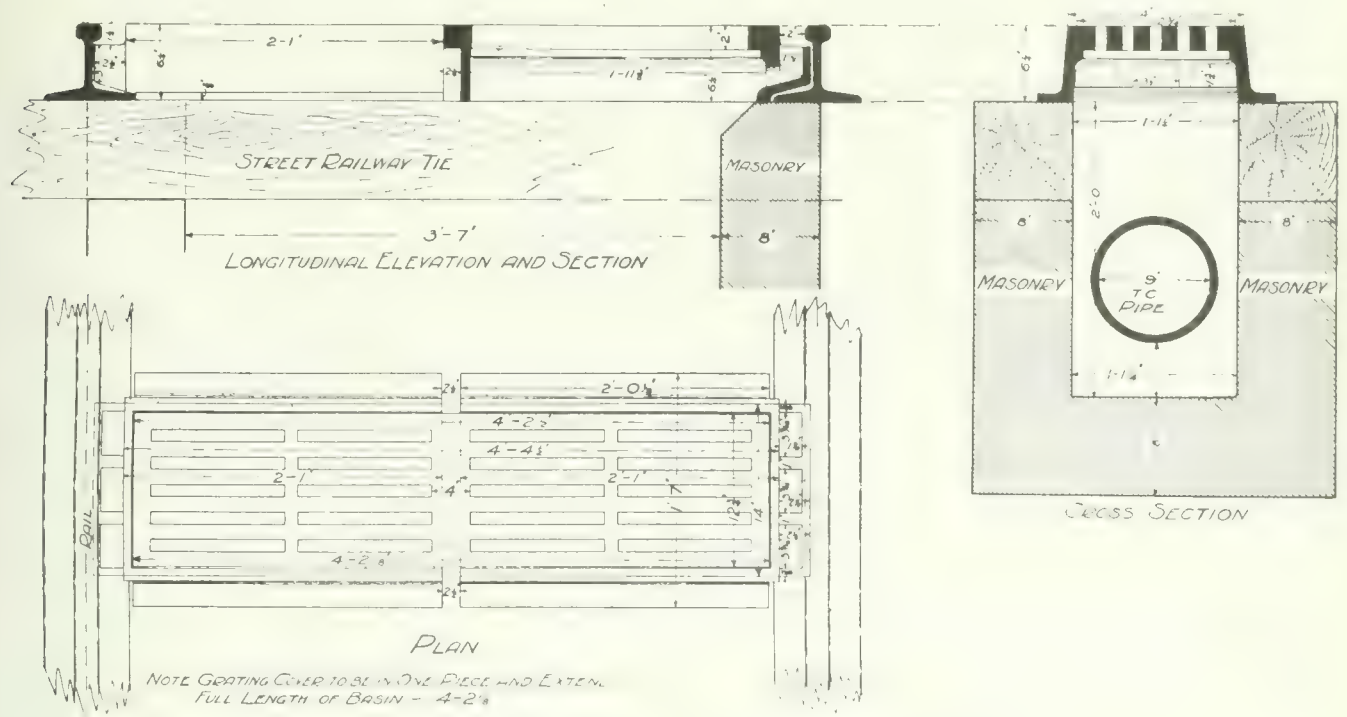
Plan and Sections of Track Basin, St. John, N.B.
